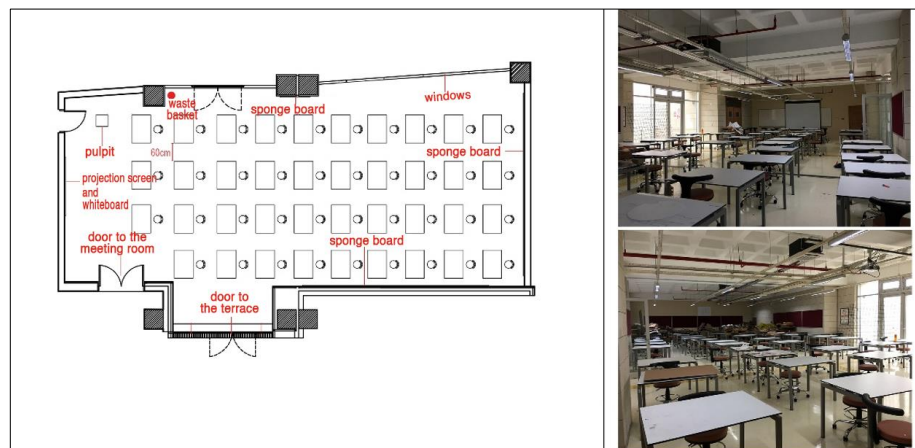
Design studio 337 plan diagram and images (Created by authors)
